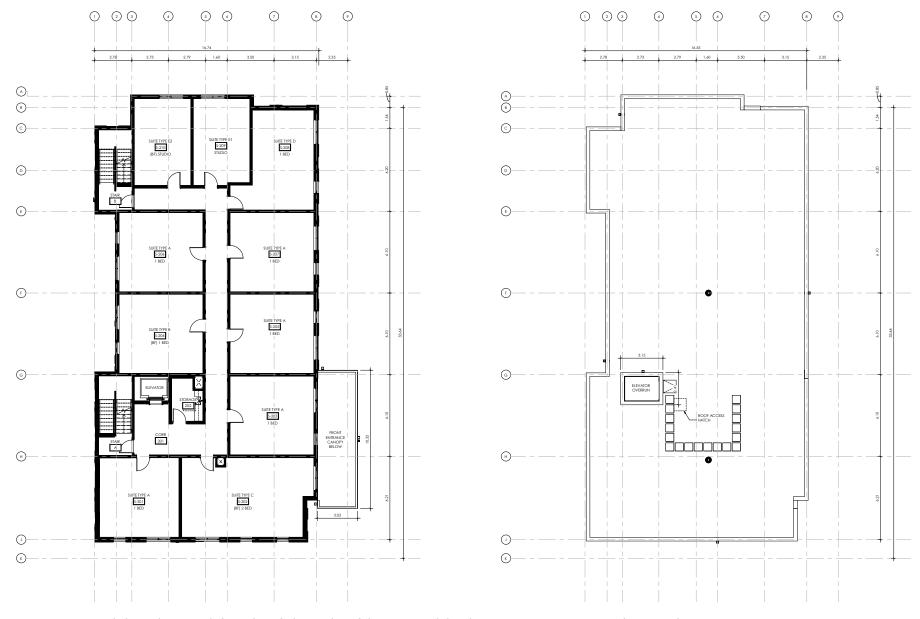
Typical Floor Plan (2-5) (left) and roof plan (right) of the proposed development. (Source: EDGE Architects, July 2023)
